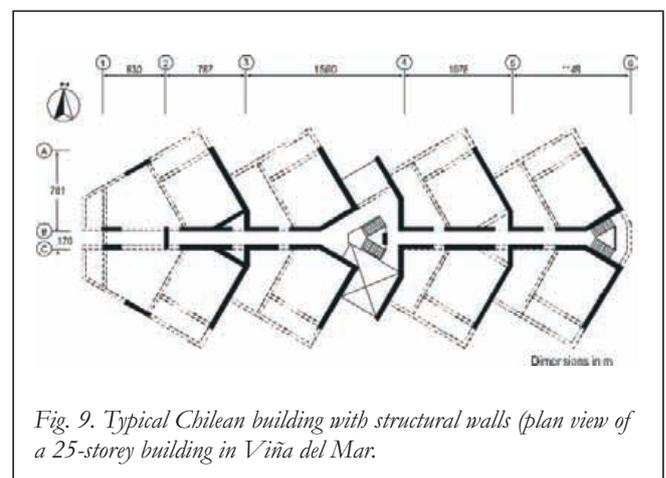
Typical Chilean building with structural walls (plan view of a 25-storey building in Vina del Mar).
